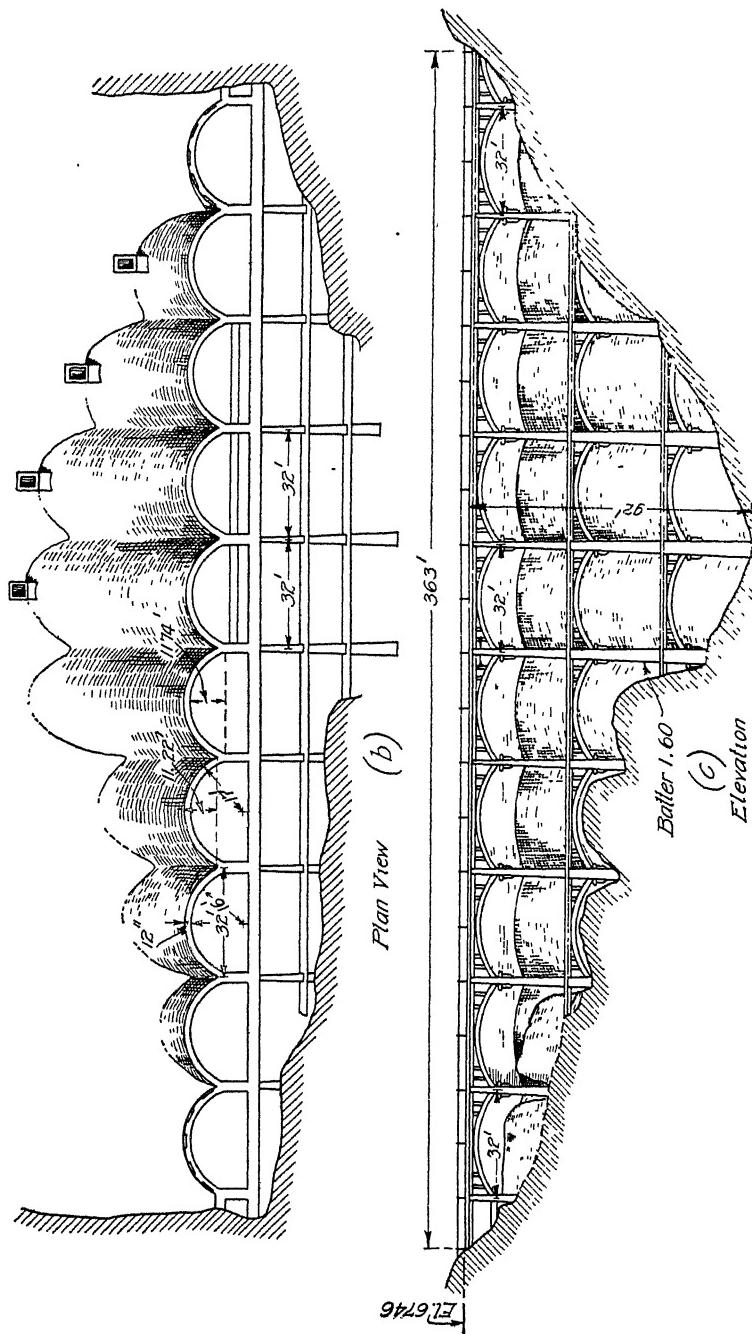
Plan and Sectional Elevation of Big Bear Valley Dam
